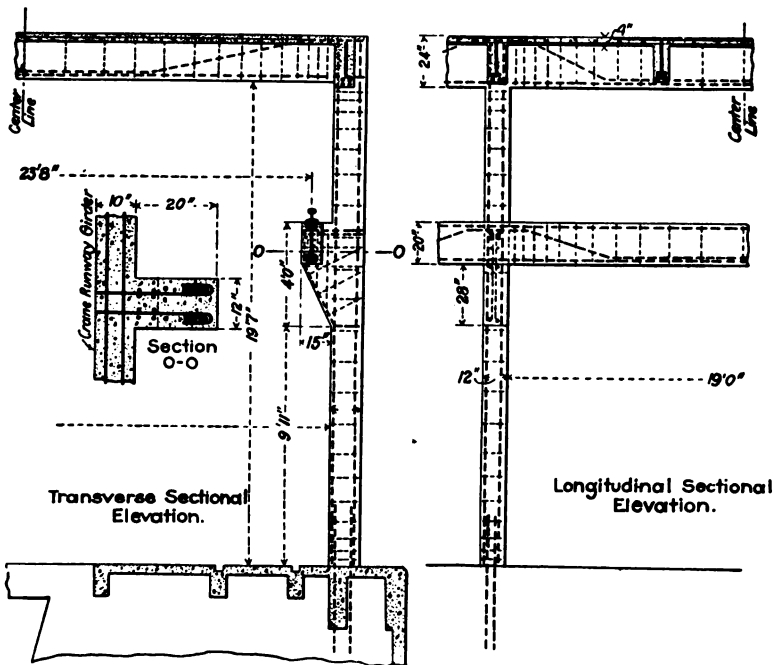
Column and Crane Girder, Ontario Power Co.'s Power House.
